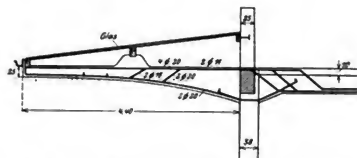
SECTION OF CONCRETE CANTILEVERS.
